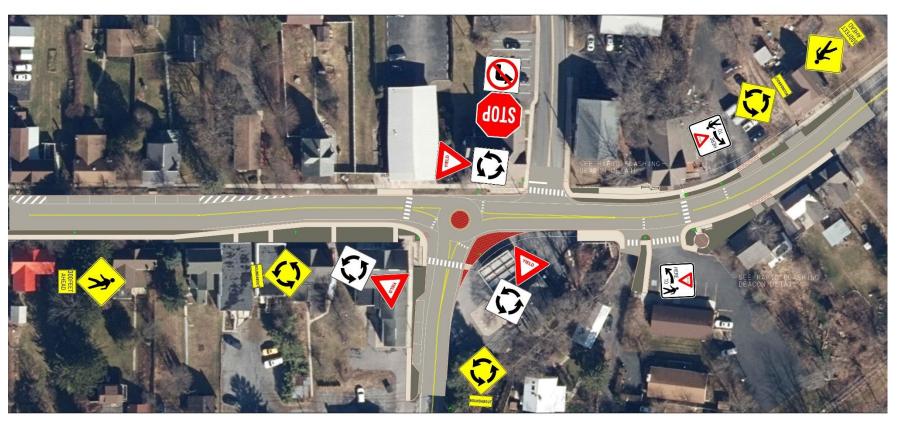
Pine Grove Road & Water Street/Nixon Road - Concept A.2, Small Roundabout Option
